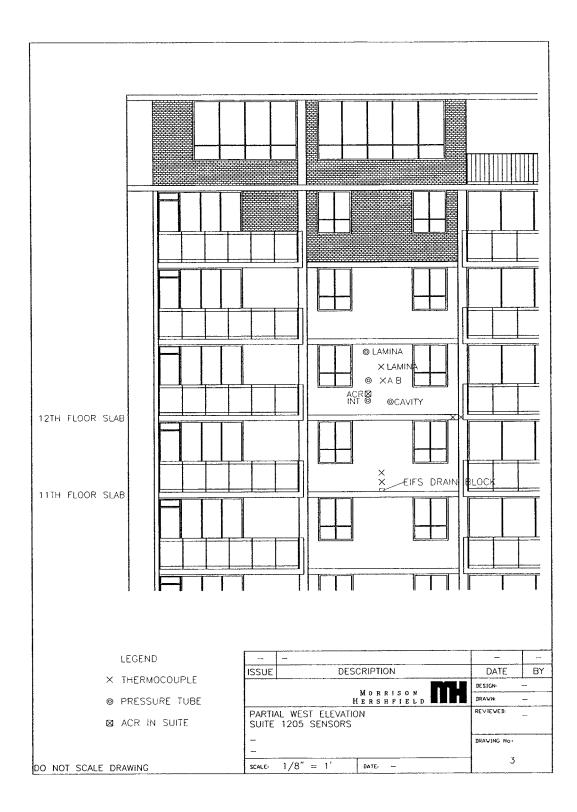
Drawing No. 3: Partial West Elevation – Suite 1205 Sensors
